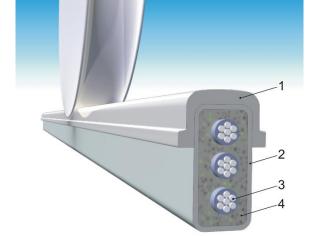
Two-rim steel wheel on a string-rail: 1 — rail head; 2 — body; 3 — string; 4 — concrete
